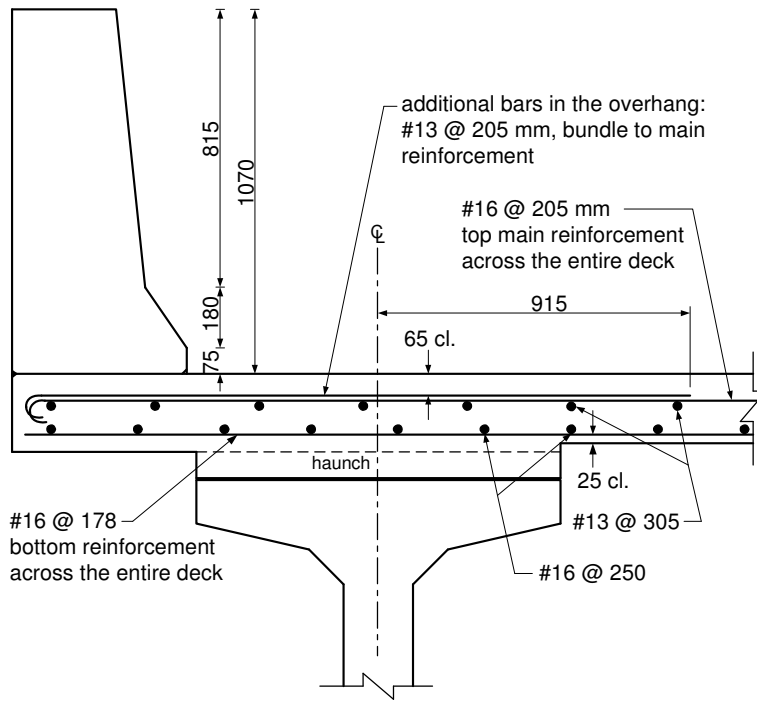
Deck Reinforcement at Midspan of Girders
